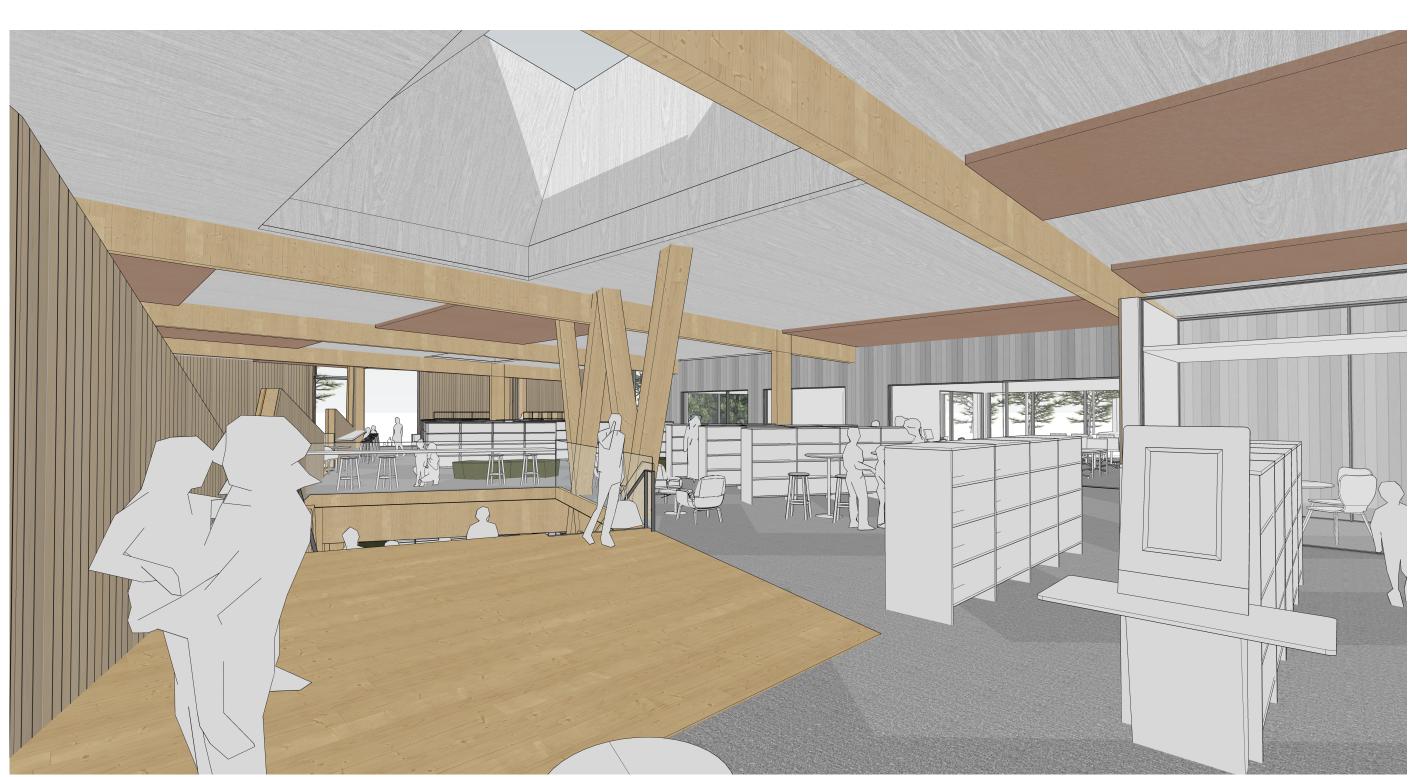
View of the level 1 interior (looking east over the bleacher stair and the central skylight above). Note: Furniture selection/layout is indicative and will be developed in later design stages.
